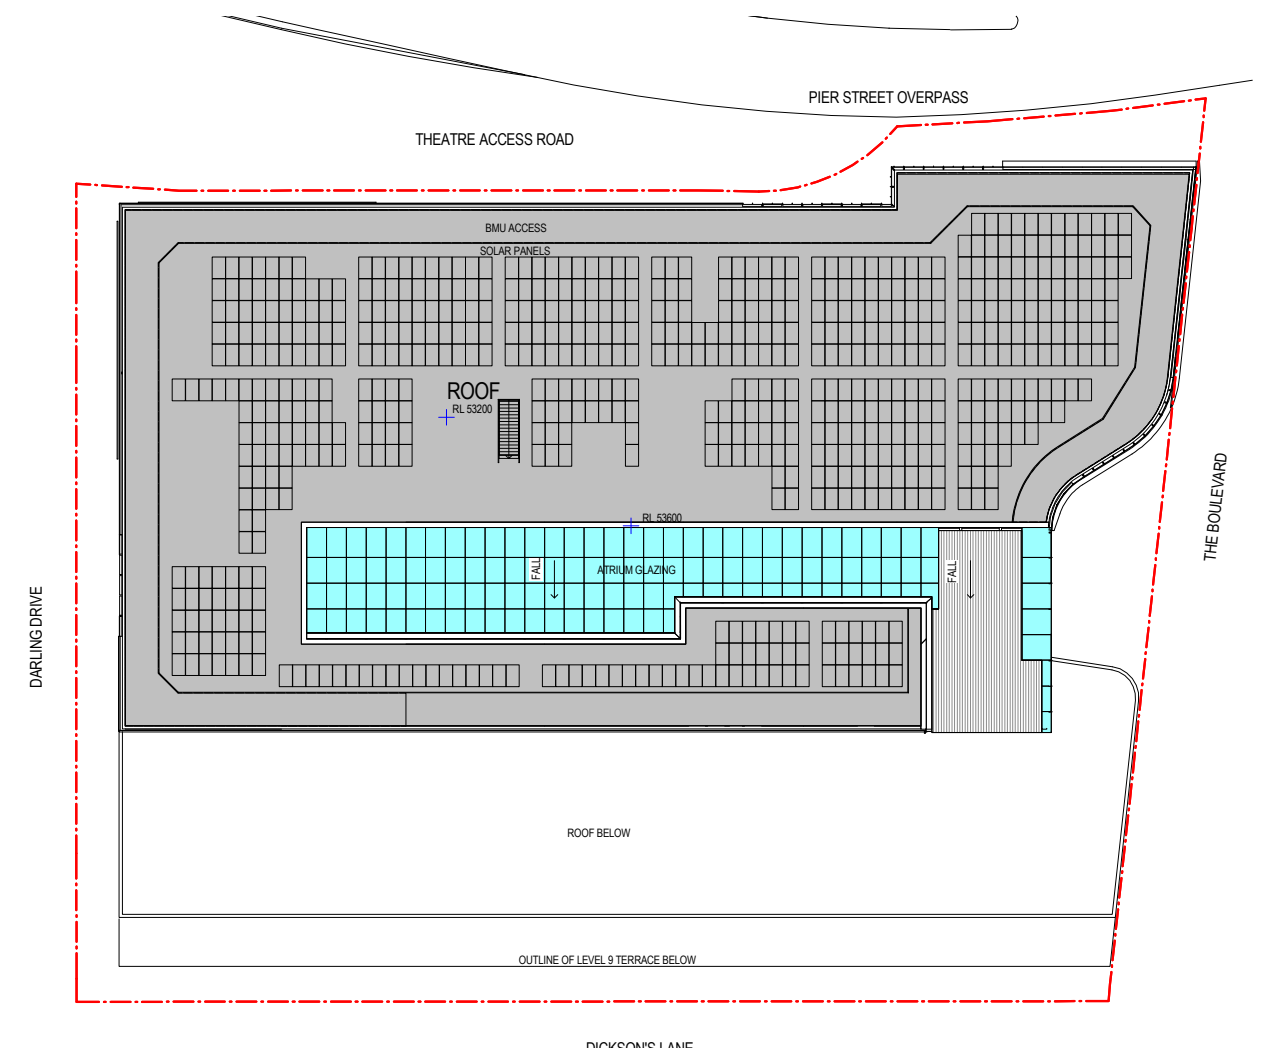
Section 96 NW Plot proposed Roof Plan with Solar Panels
